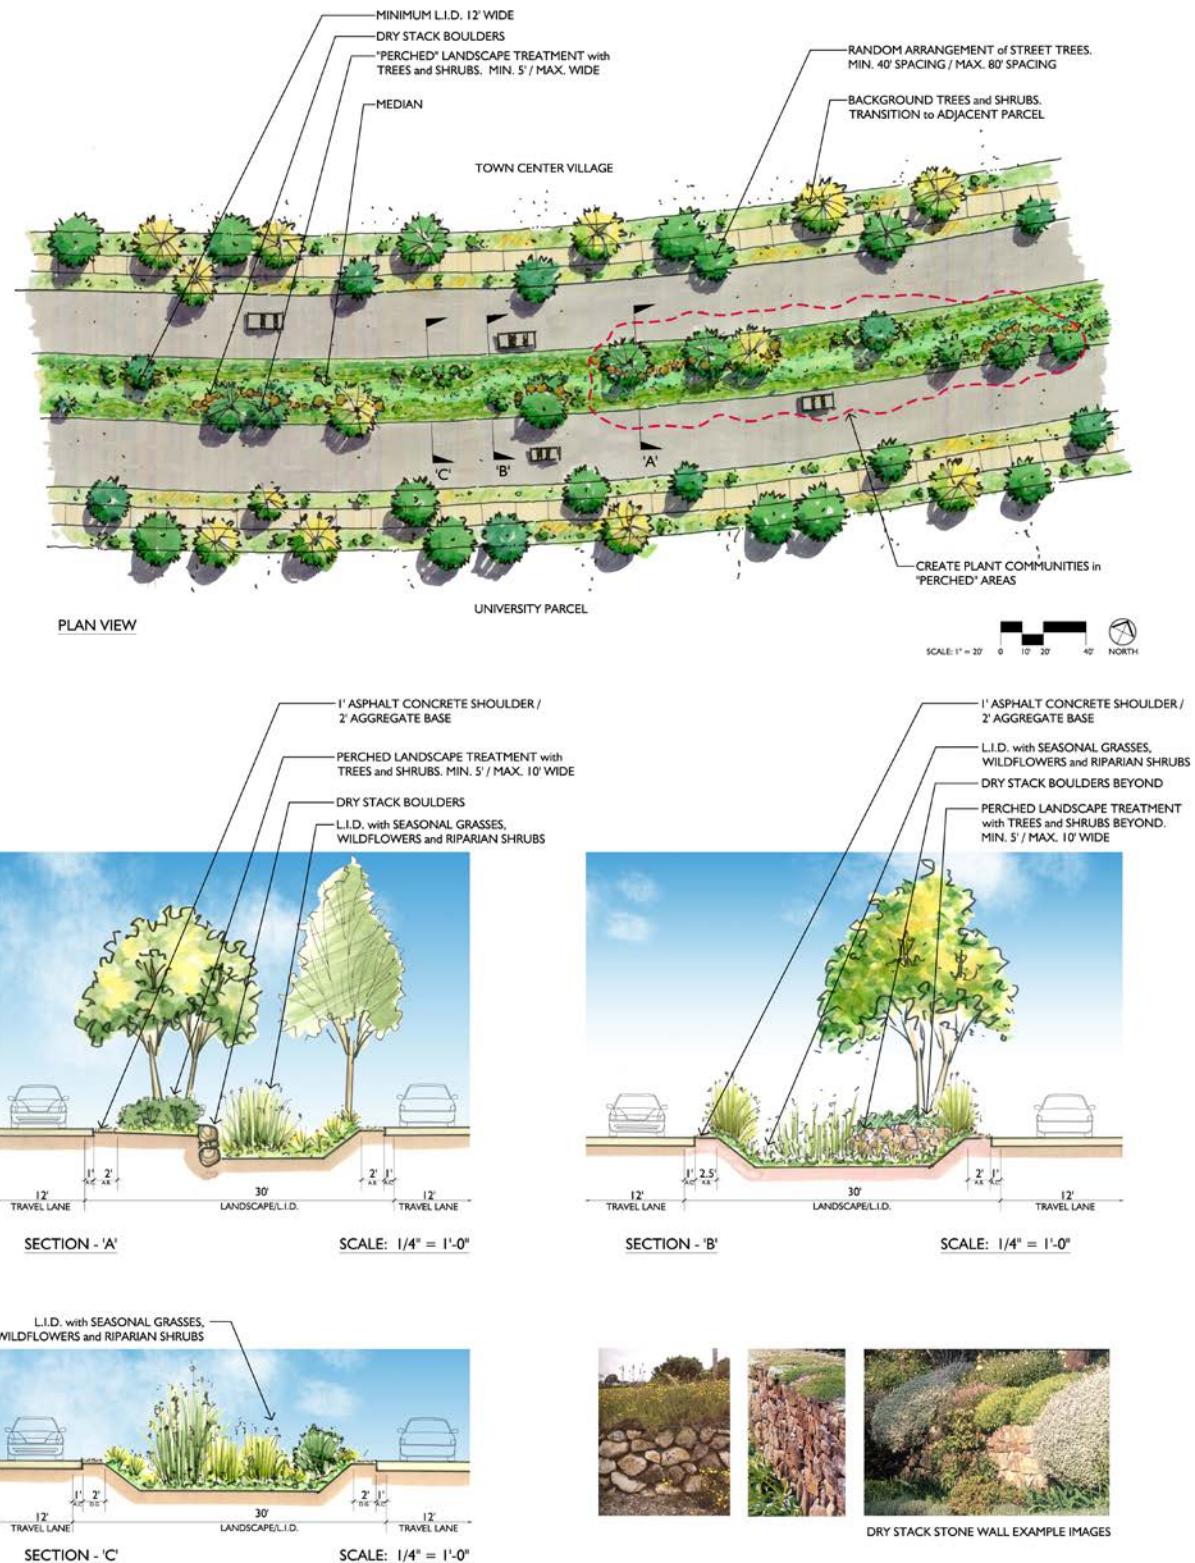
(a): Streetscape Concepts for Street Sections 4A-1, 6B-1 and 6B-2
